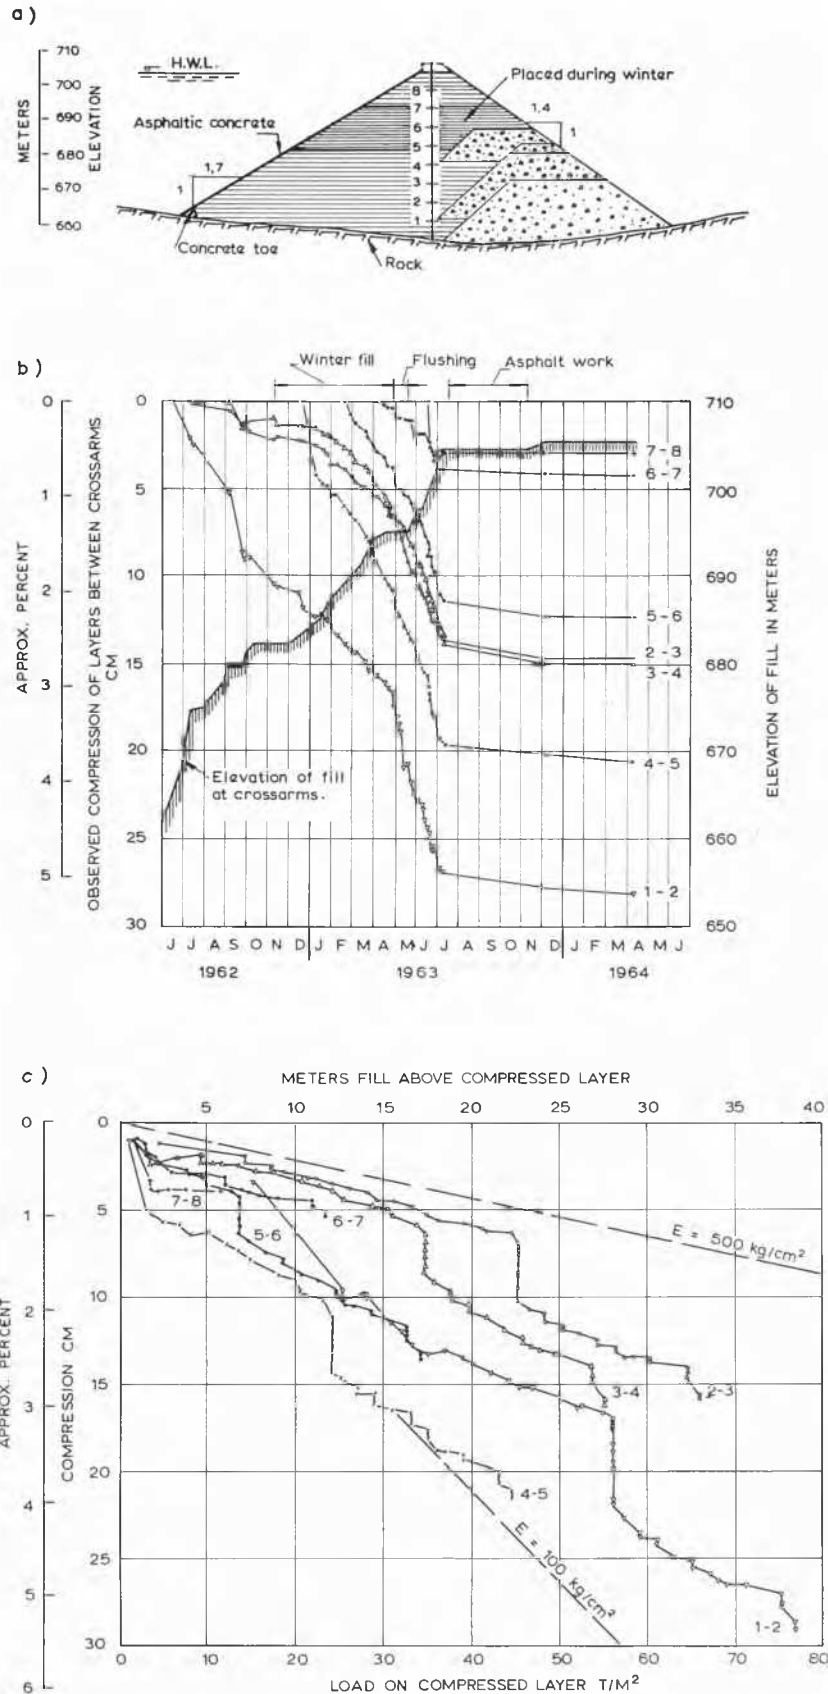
Compression of layers at Installation II. (a) section through dam, (b) compression of layers between crossarms against time, (c) compression of layers between crossarms against pressure of overlying fill.
